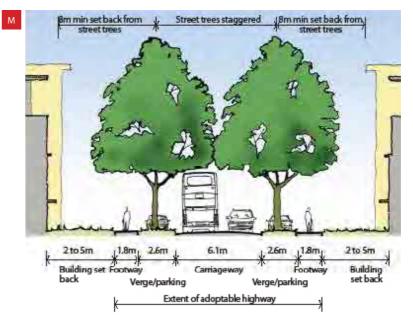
Section through Primary Road - Spine Road Southern Park Road
